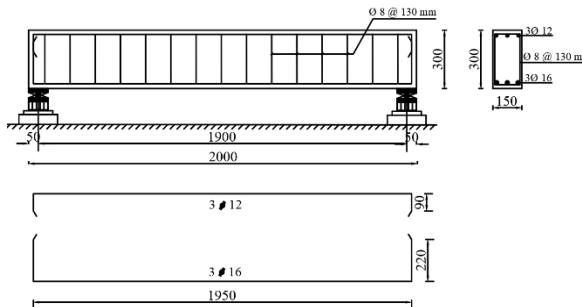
Geometry and reinforcement details for beam B0 (Dim. in mm)
